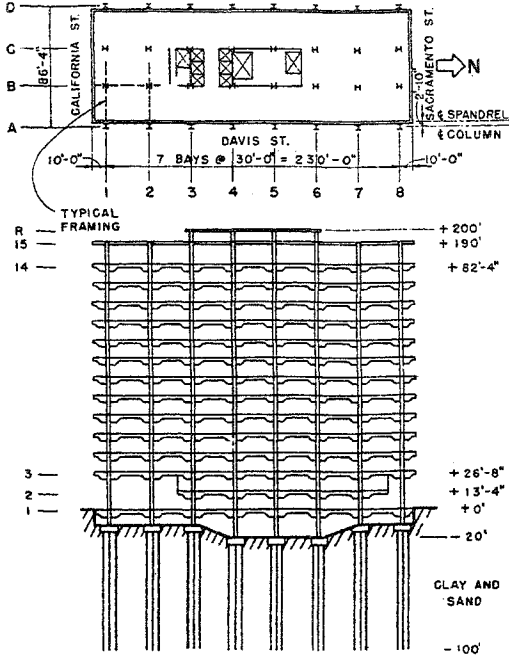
SCHEMATIC ELEVATION AND PLAN
